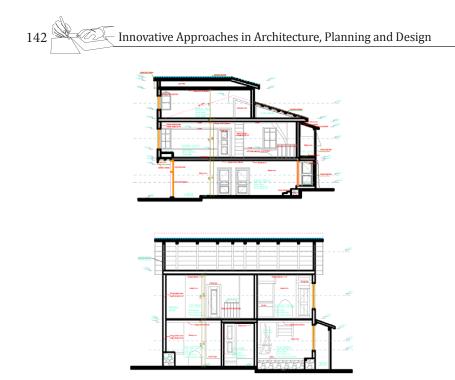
Halim Düzgün House's rolove a-a section and b-b section
